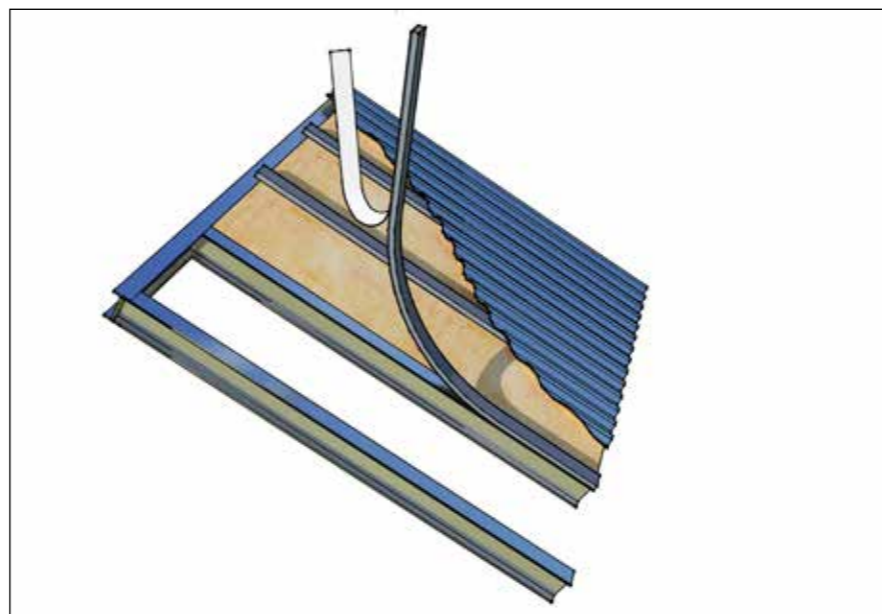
Attaching Spacetherm CBS / Spacetherm A2 CBS to metal framing
